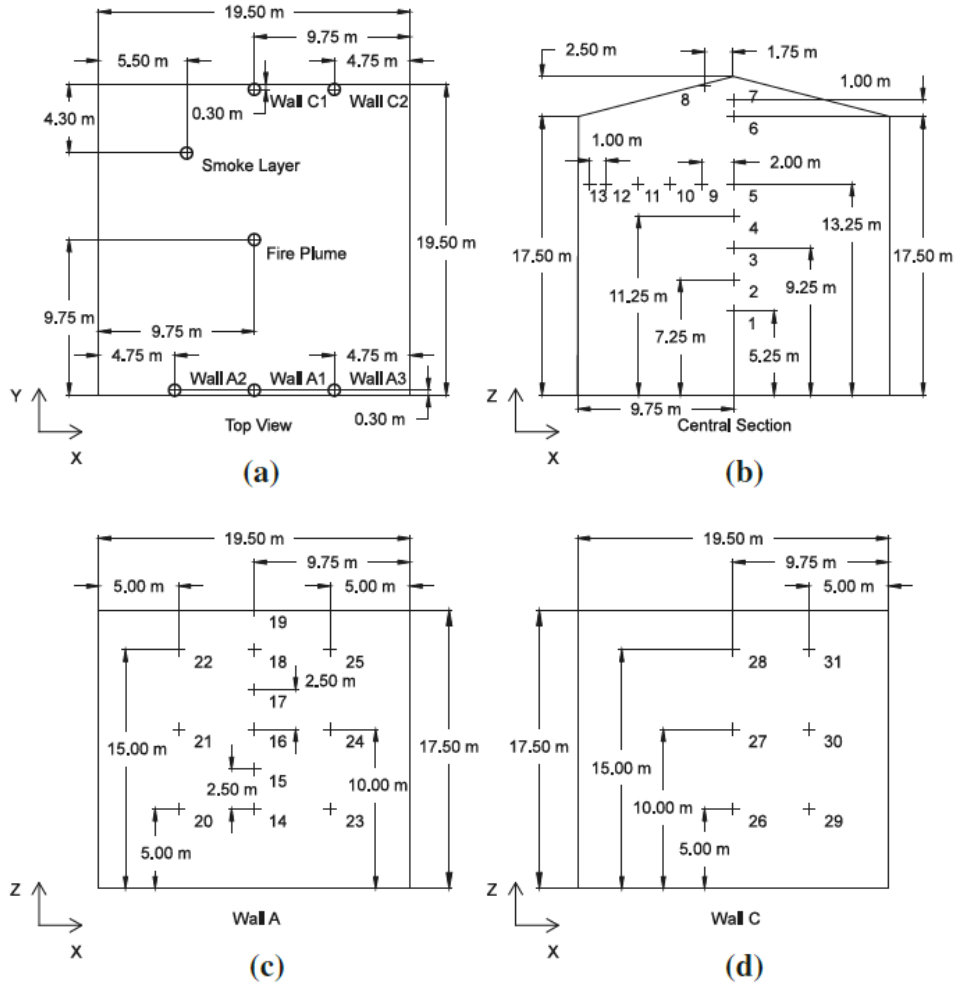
Thermocouple layout on the atrium. (a) thermocouple tree locations, (b) central section, (c) at 30 cm from wall A and (d) at 30 cm from wall C [66].
